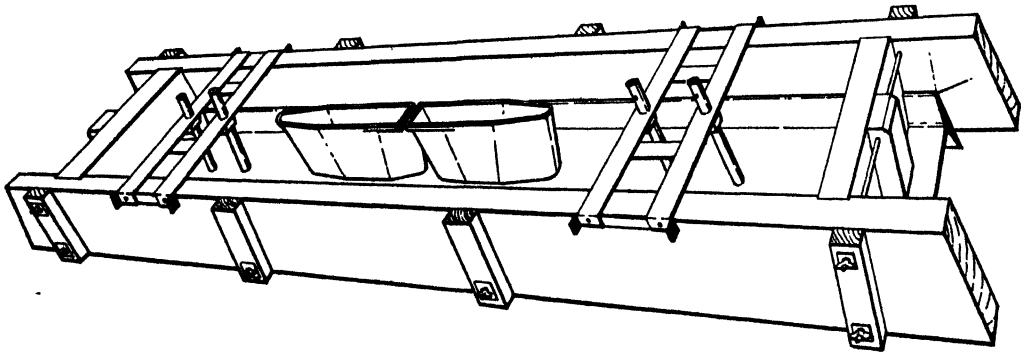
TIMBER AND STEEL MOULD FOR MAKING PRE-CAST CONCRETE SLEEPERS
